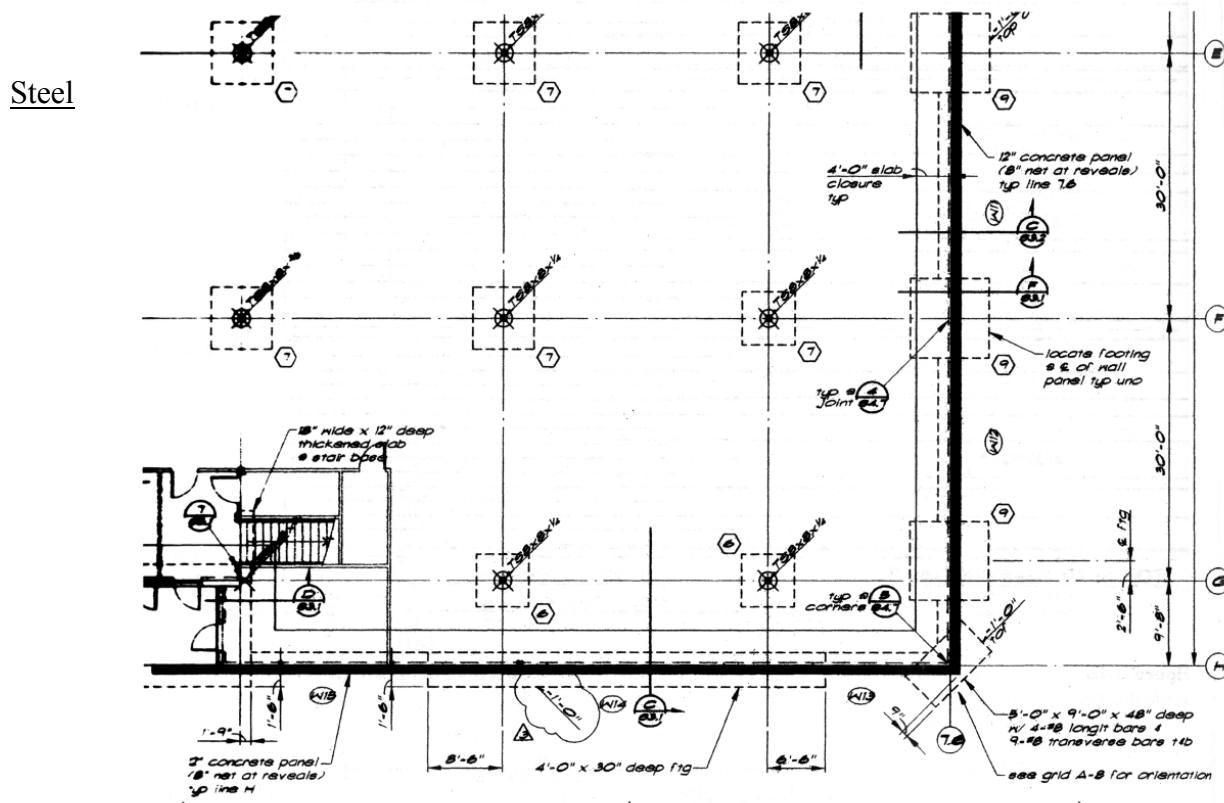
Drawings of structural steel framing systems begin with the foundation plan, which is where the columns
